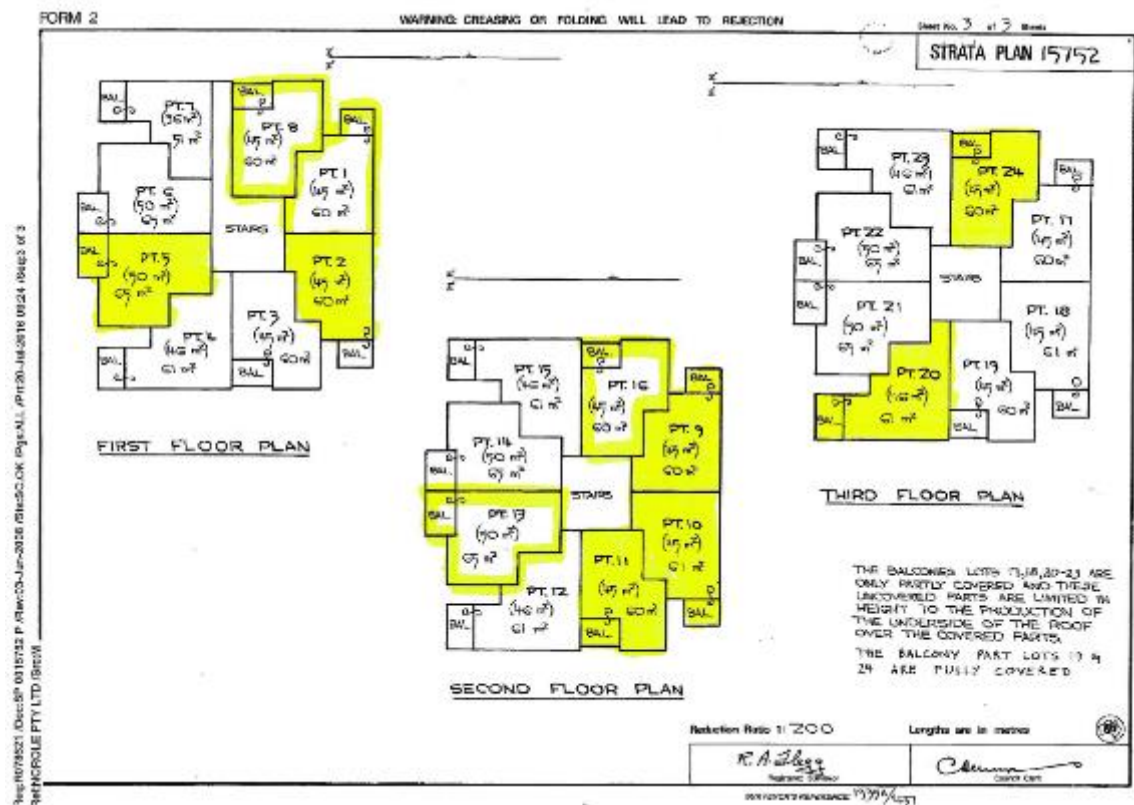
Strata Plan 15752, No. 26 - 32 Whistler Street, Manly
